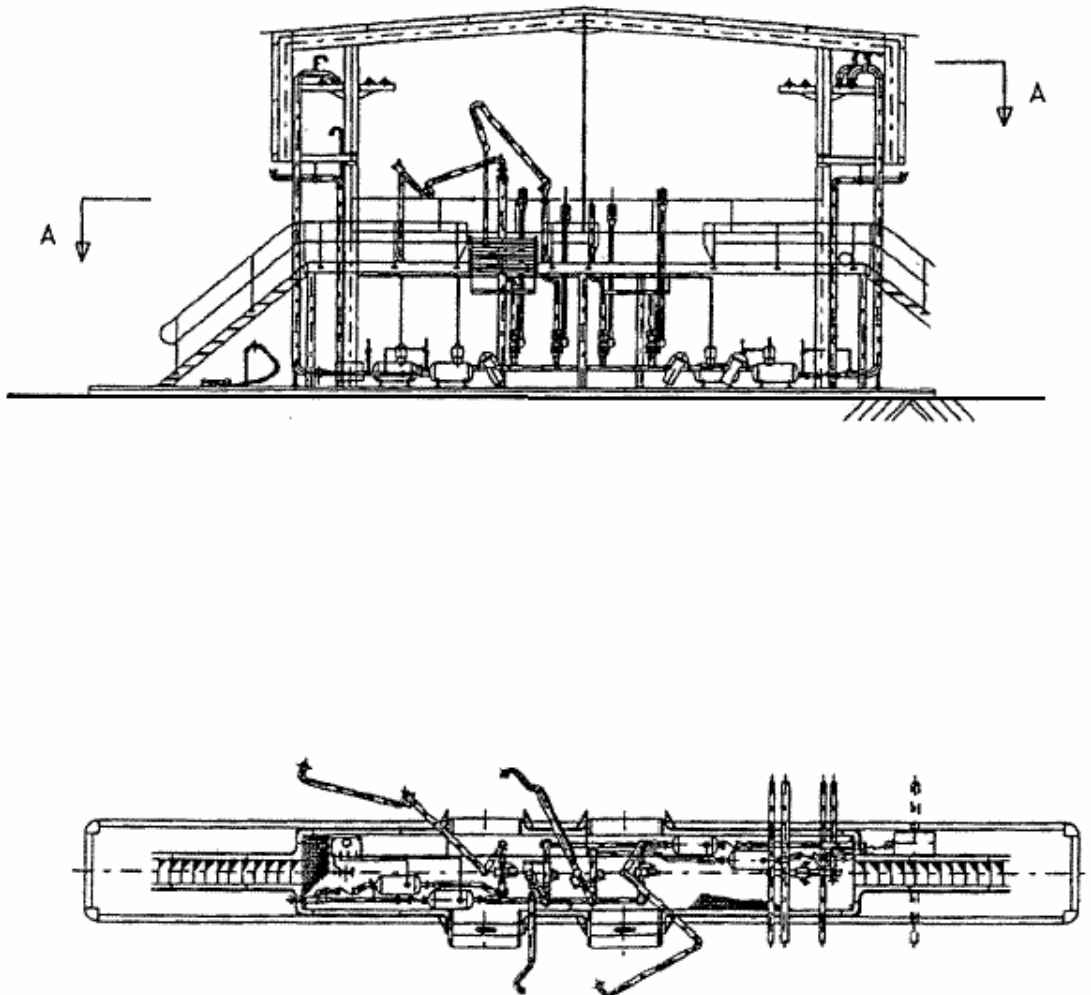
Typical sketch of piping installation on gantry for land road loading arms
